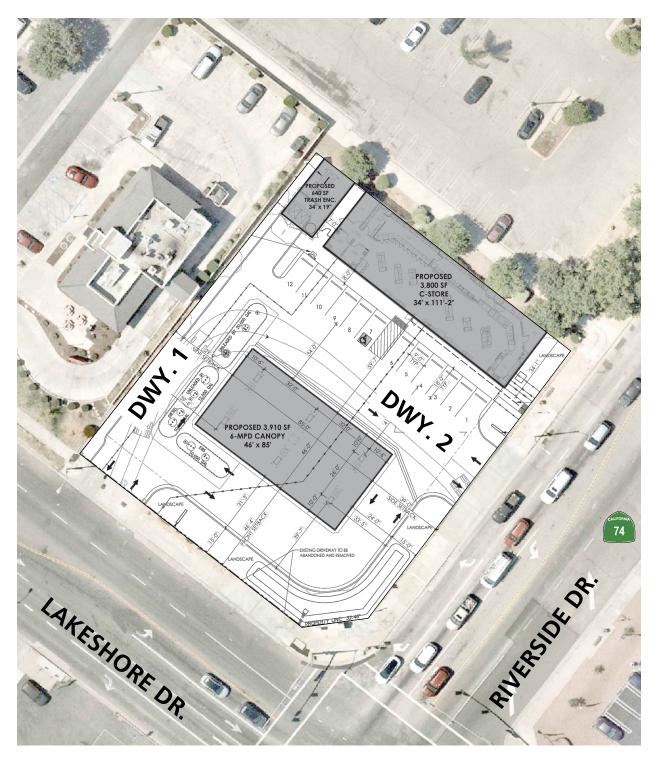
PRELIMINARY SITE PLAN
